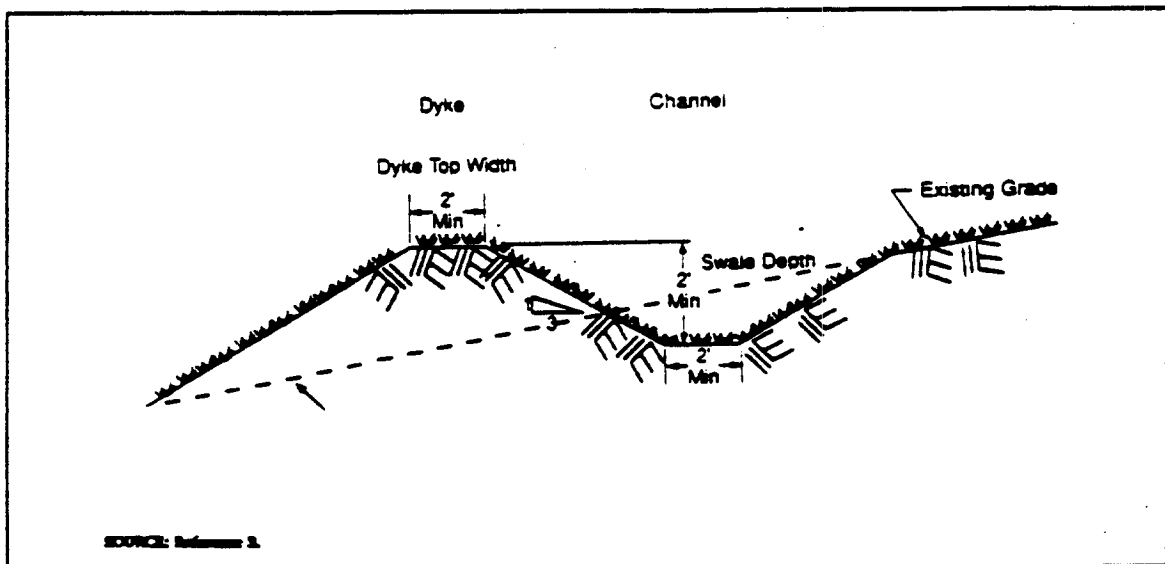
TYPICAL DIVERSION SWALE DETAILS
